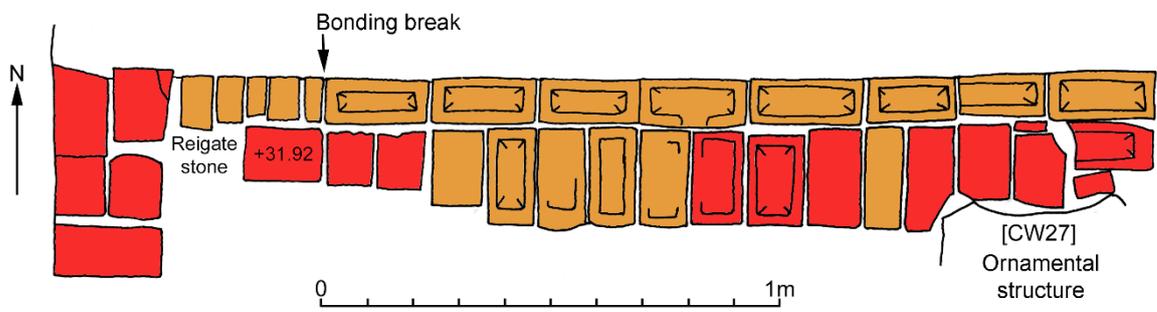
The top of the southern side wall of culvert section 2 showing the red bricks and yellow stock bricks.
